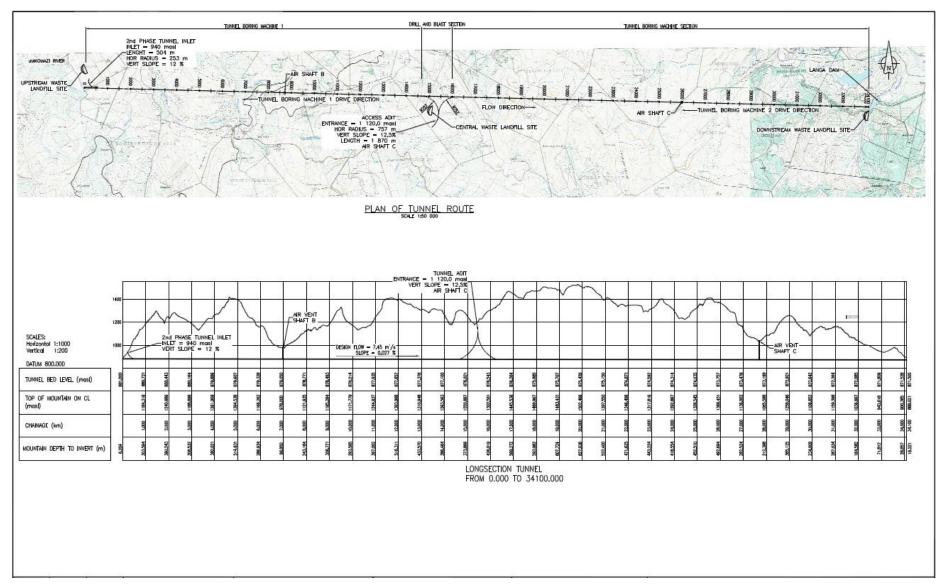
Long section and chainages of uMkhomazi – uMlaza Tunnel
